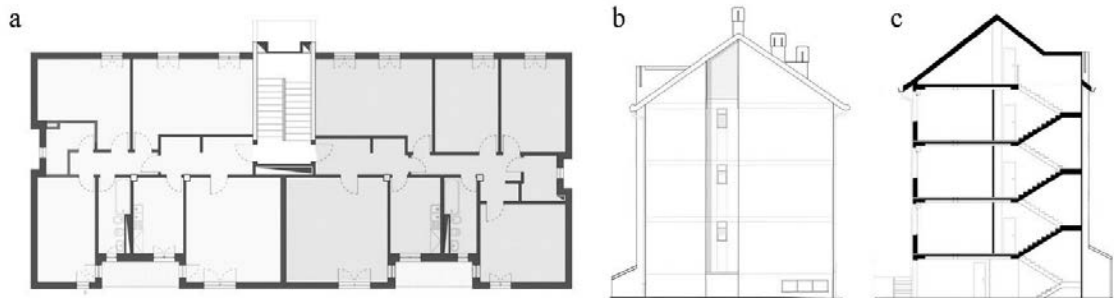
a) Typical floor; b) west elevation; c) cross section.
